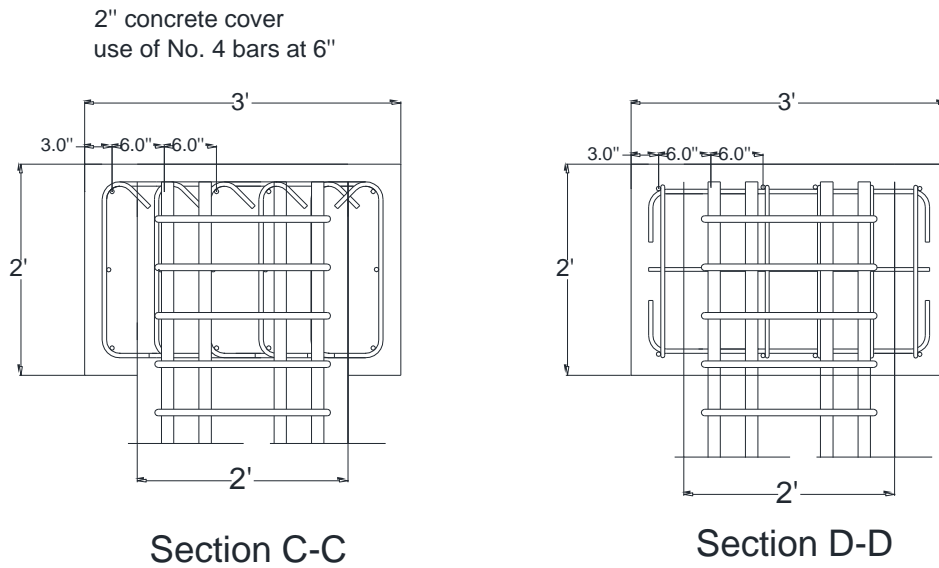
Elevation view of cap details (see Figure 3.8 for section locations)
